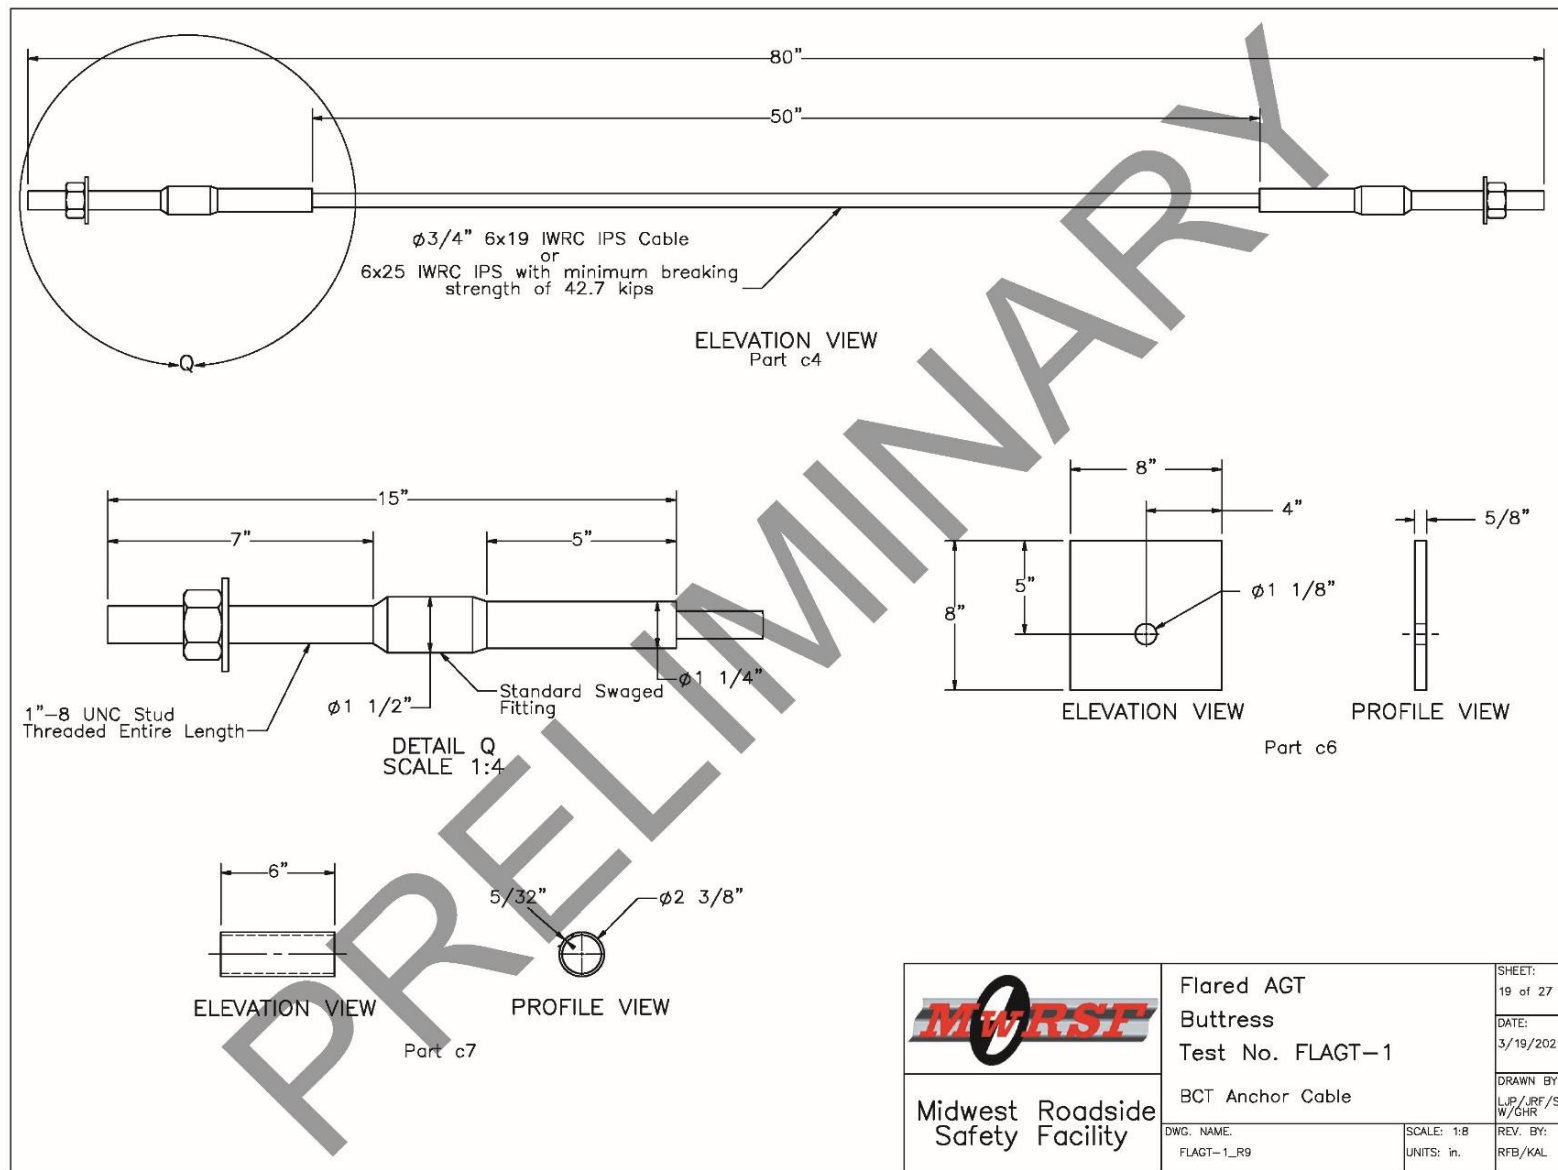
BCT Anchor Cable, Test No. FLAGT-1
